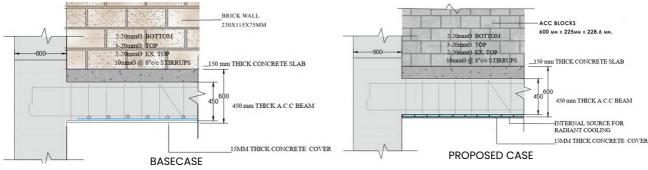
WALL, BEAM AND COLUMN SYSTEM - BASE CASE VS PROPOSED CASE
